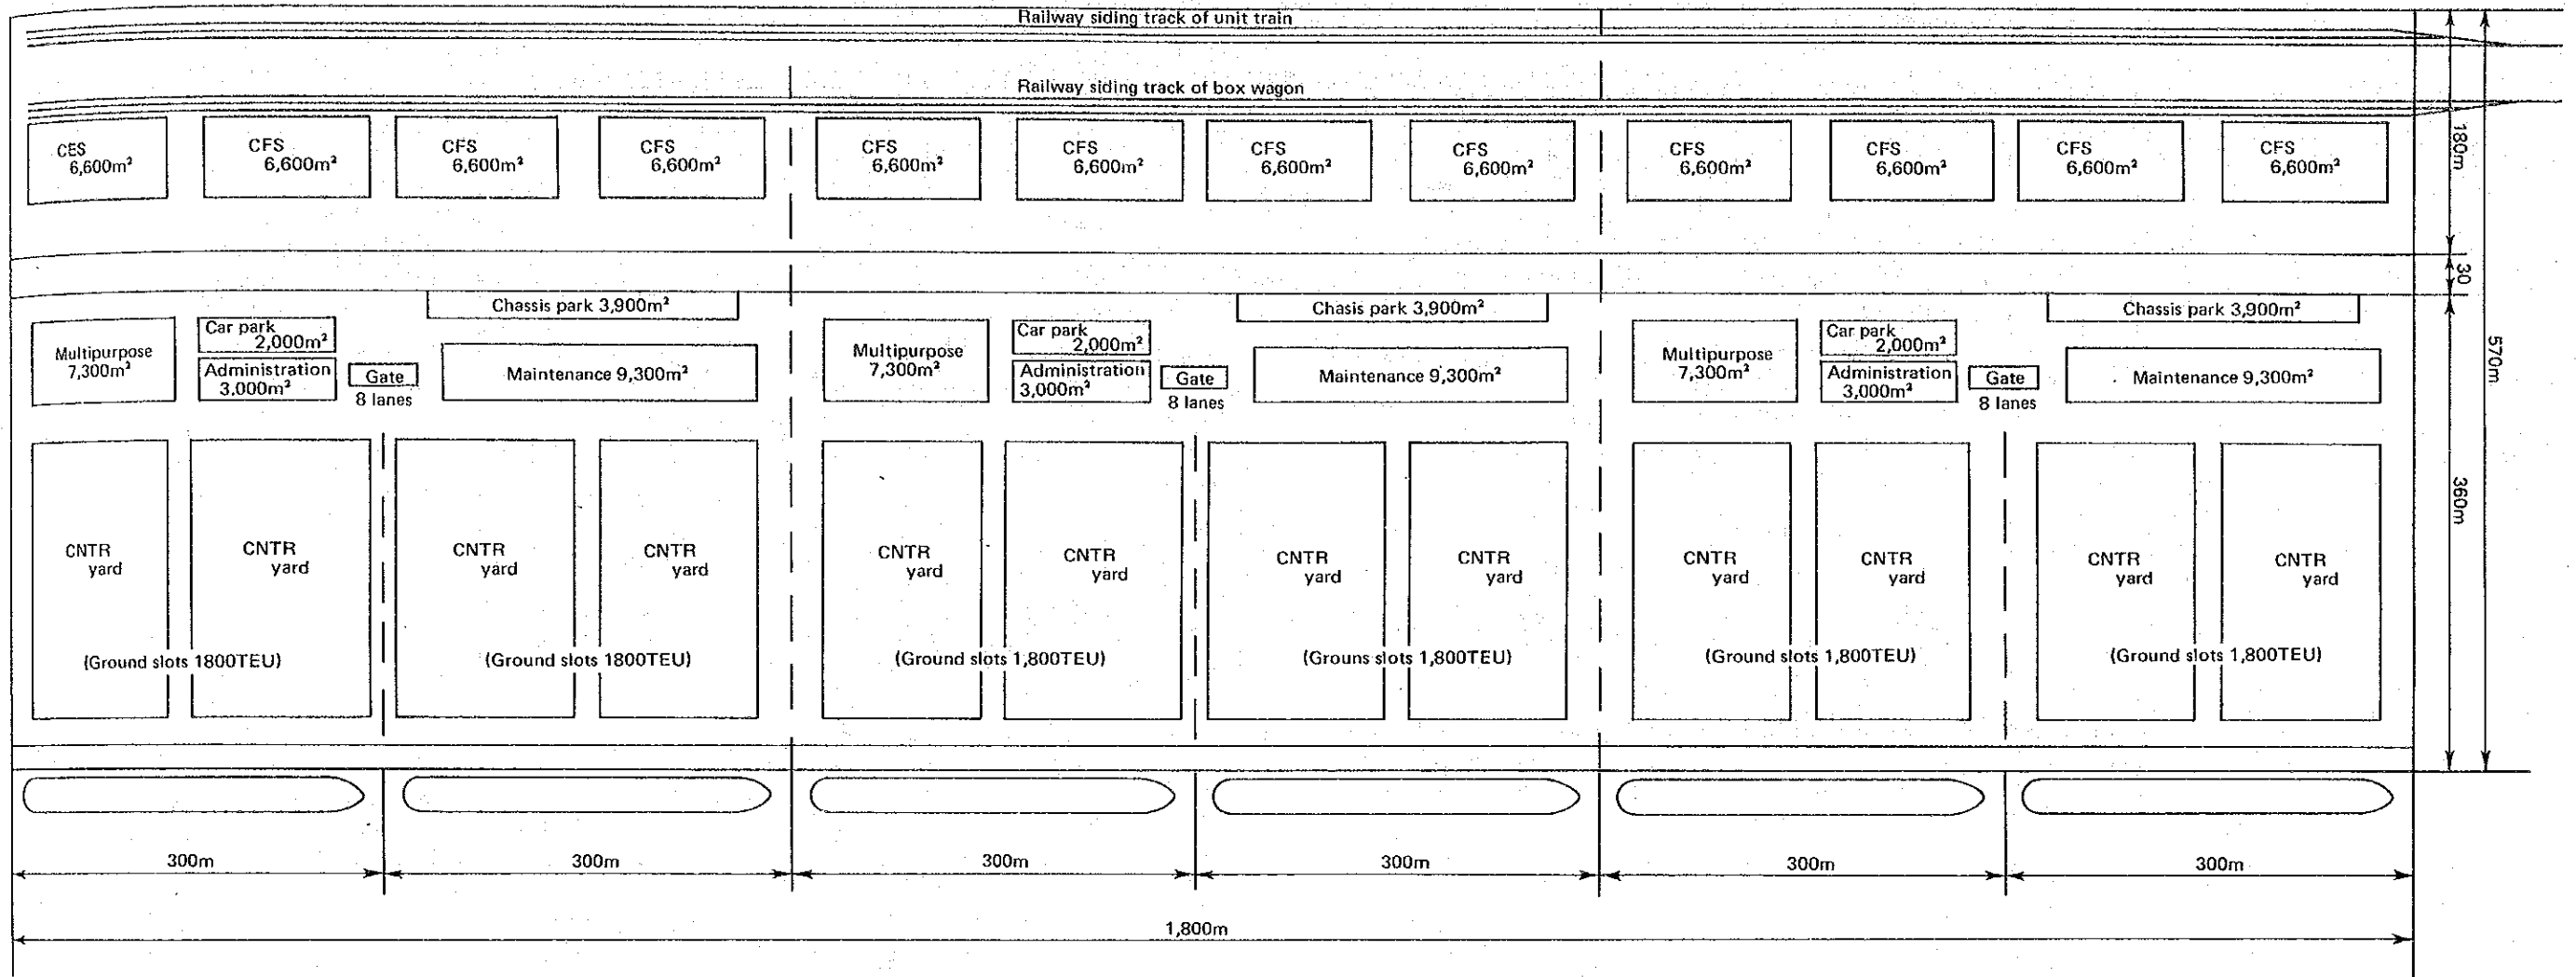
Layout of Port Terminal (Urgent Plan)
